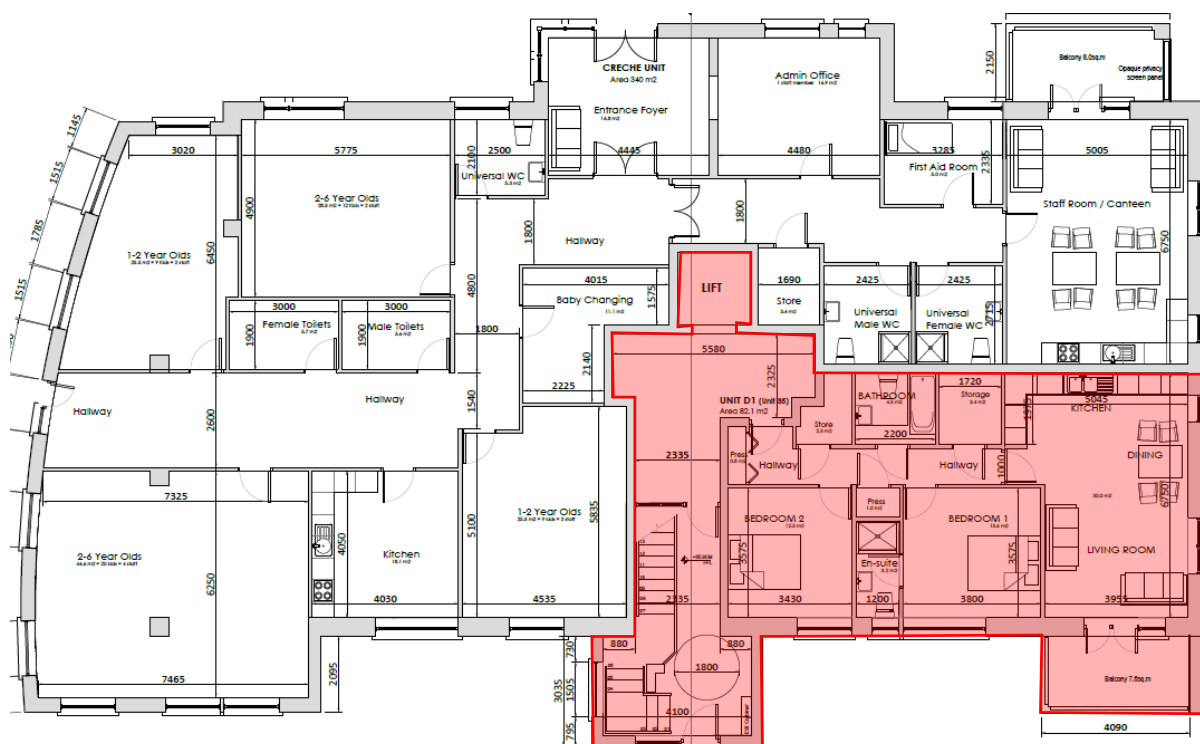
The ground floor plan of Apartment Block D accommodates 1 no. residential apartment and access to the upper floor residential units (red outline) and the proposed crèche facility. The crèche provides dedicated rooms for 1-2 year olds and 2-6 year olds, in conjunction with staff/admin facilities.
